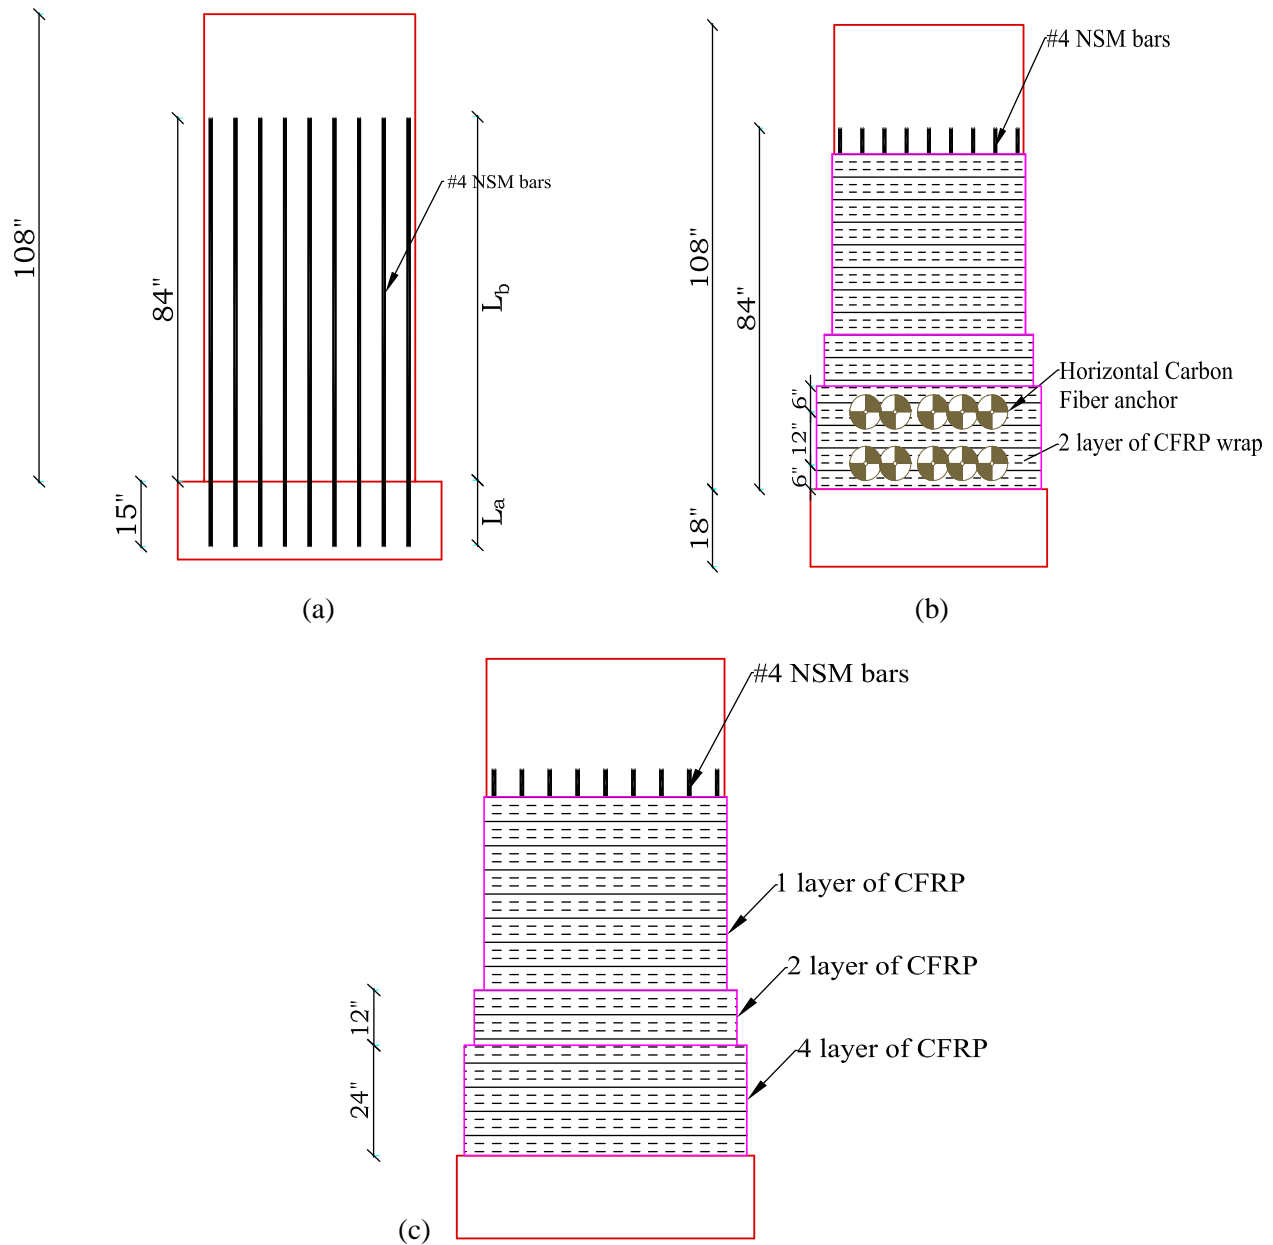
Retrofit design of as-built wall pier using NSM CFRP rods for Specimen R2
